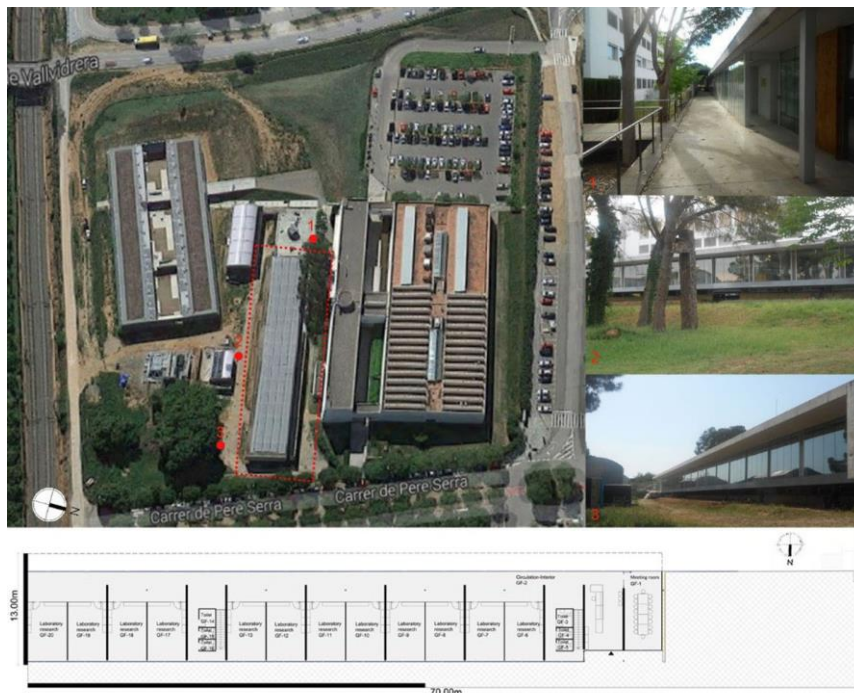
Overview of case study B (PUC) and its floor plan. Source: Author
